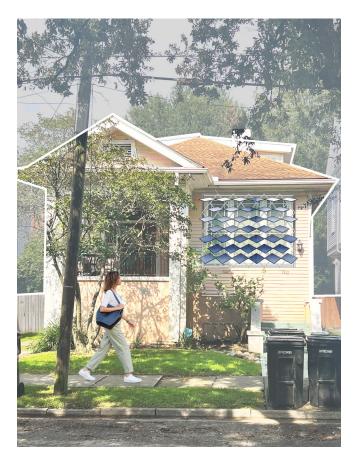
An example of a typical New Orleans house with the proposed shading systems. Authors.
